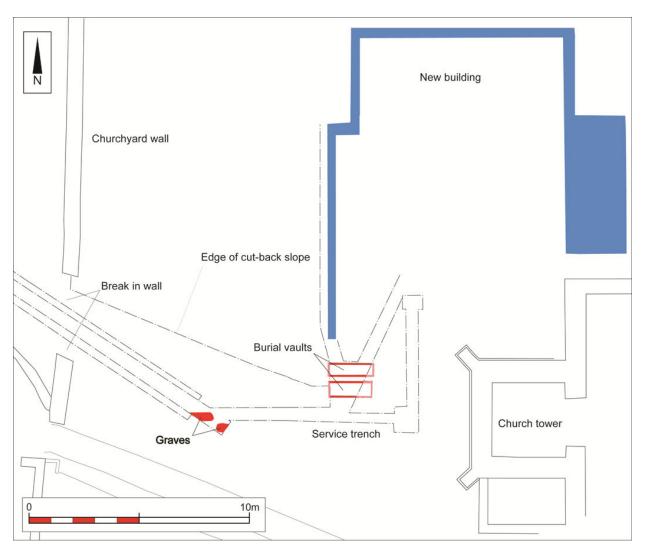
Ground-works plan, adapted from architect's original. New building shown in blue and graves in red.
